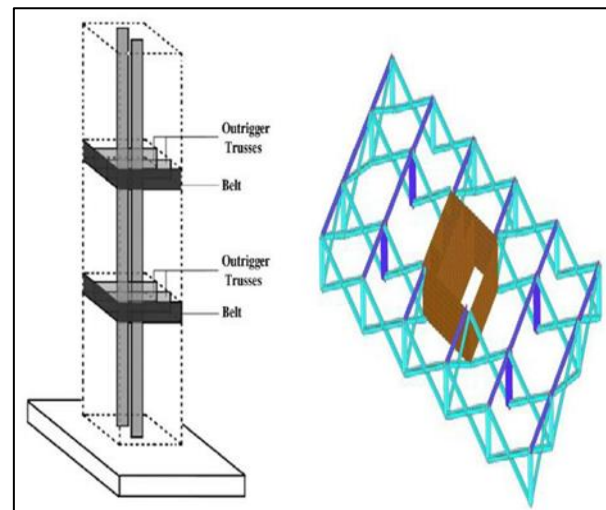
Structure with outriggers and Fig 1.2: 3D view of Outrigger and belt truss
